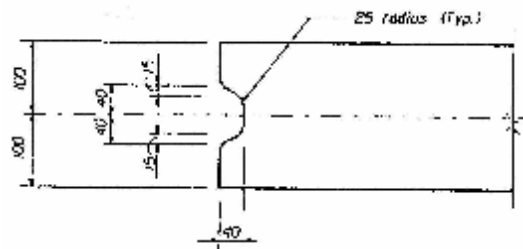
Non-grouted Match-cast Joint
